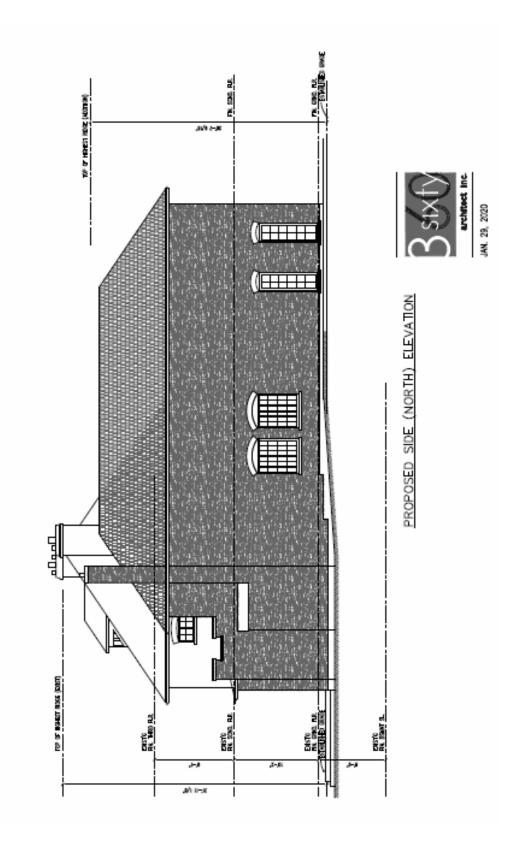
The north or side elevation of 1341 Stavebank Road with proposed addition. (Image from owners.)
